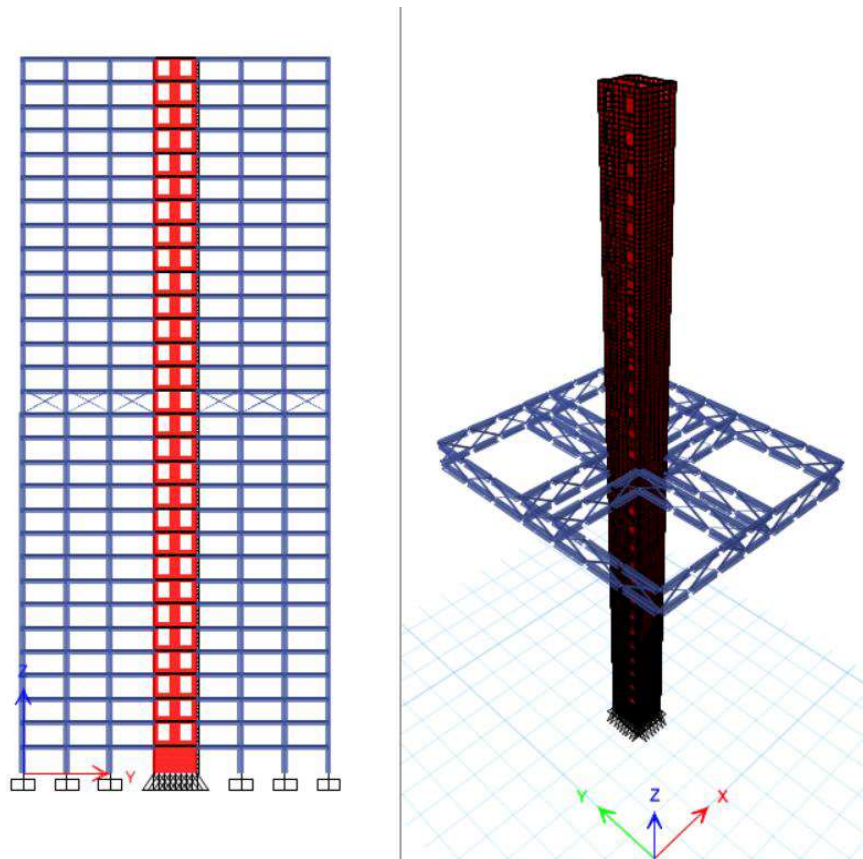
8 Structural Plan and Elevation Views of Case IV Model
